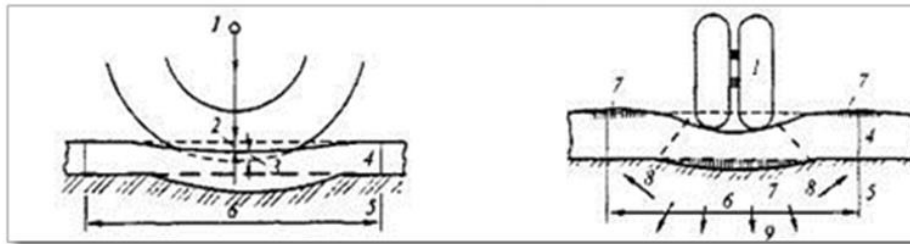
The scheme of formation of wave deformation of road surfaces under car wheels: 1 - wheel; 2 - bending of the coating; 3 - tire compression; 4 - road surface; 5 – road pyi; 6 - turning width; 7- stretching zones and cracks in the coating; 8 - bulging of the grout; 9 - direction of soil compaction.
